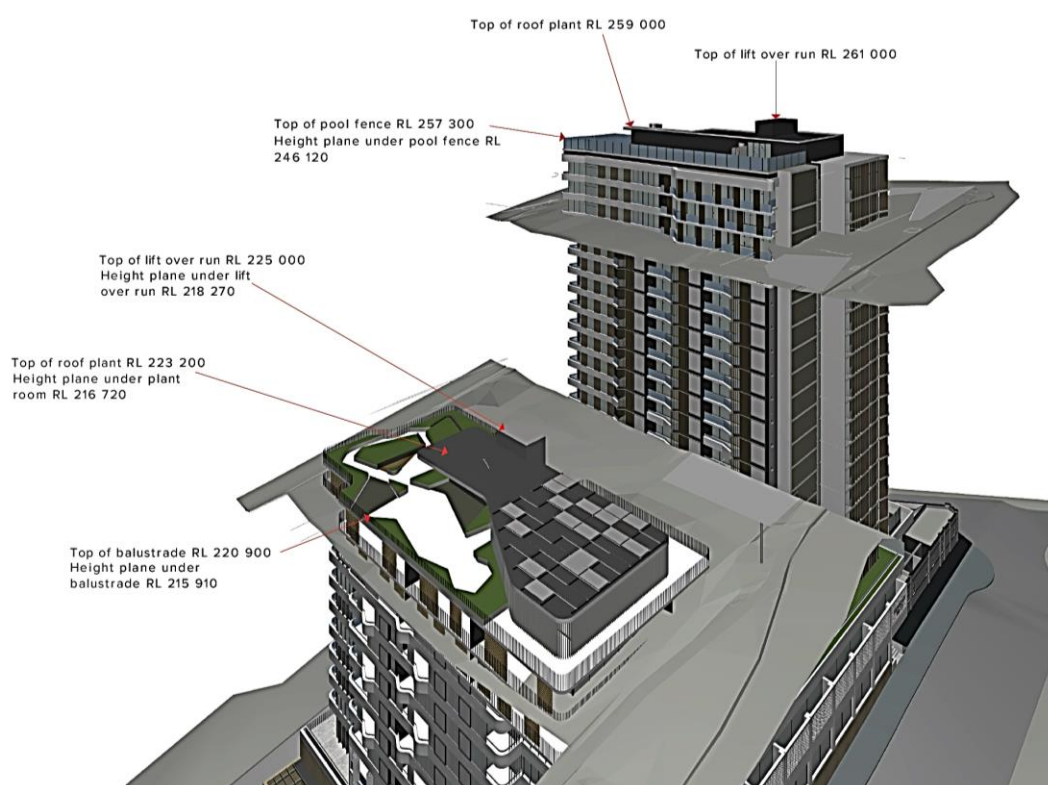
Building Height Plane Diagram (Turner Architects, 2019)
